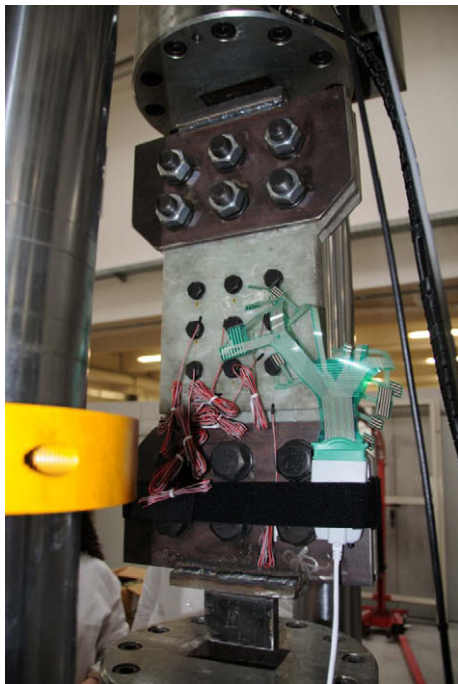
Fixture attached to a universal 630 kN servo-hydraulic testing machine.
